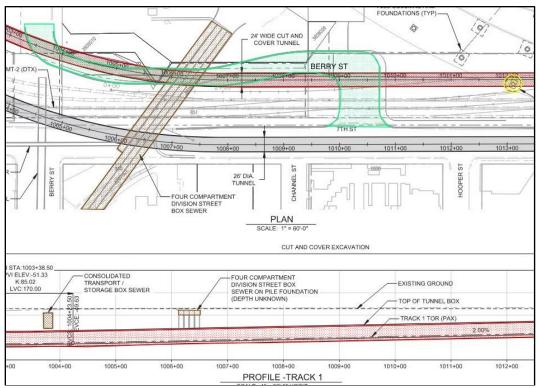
Interference Issues Pertaining to the Cut-and-Cover Section for Alternative C PAX Alignment (red). Division Street Box Sewer (brown), Berry Street (green), and Relocation of Existing I-280 column (yellow).
